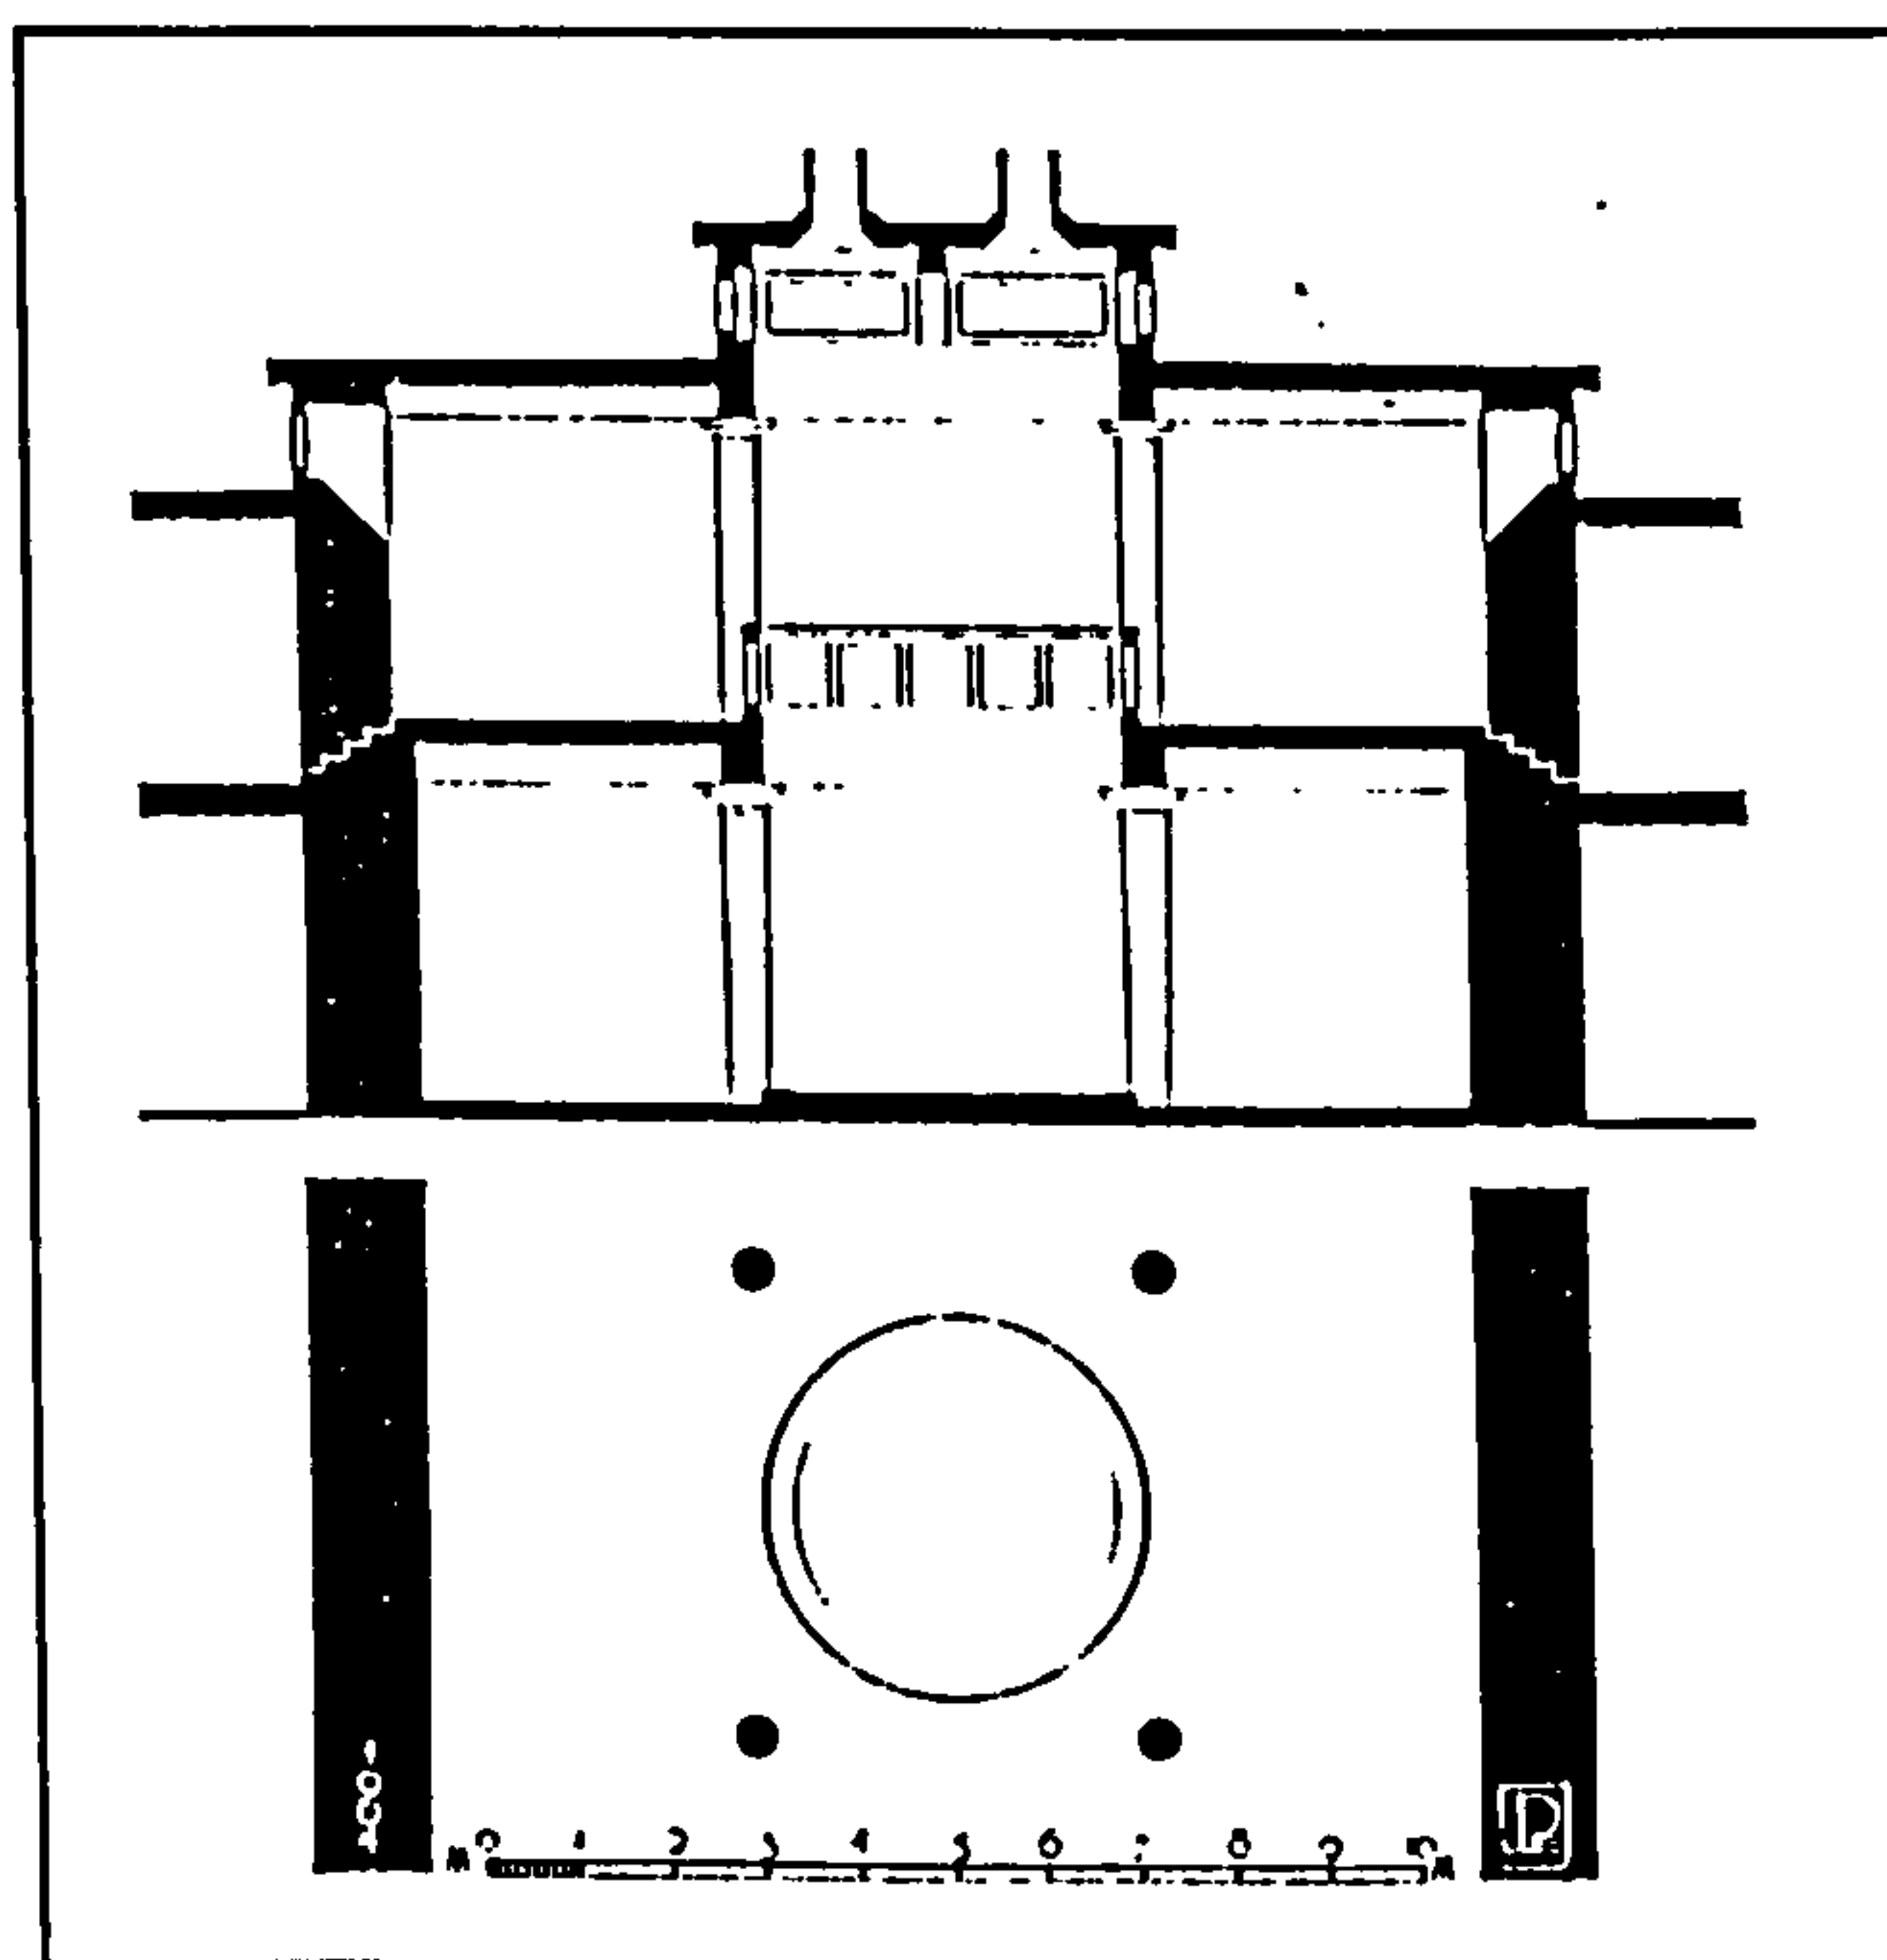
Plan and section of central area, Palace of Nestor, Pylos. Piet de Jong.
